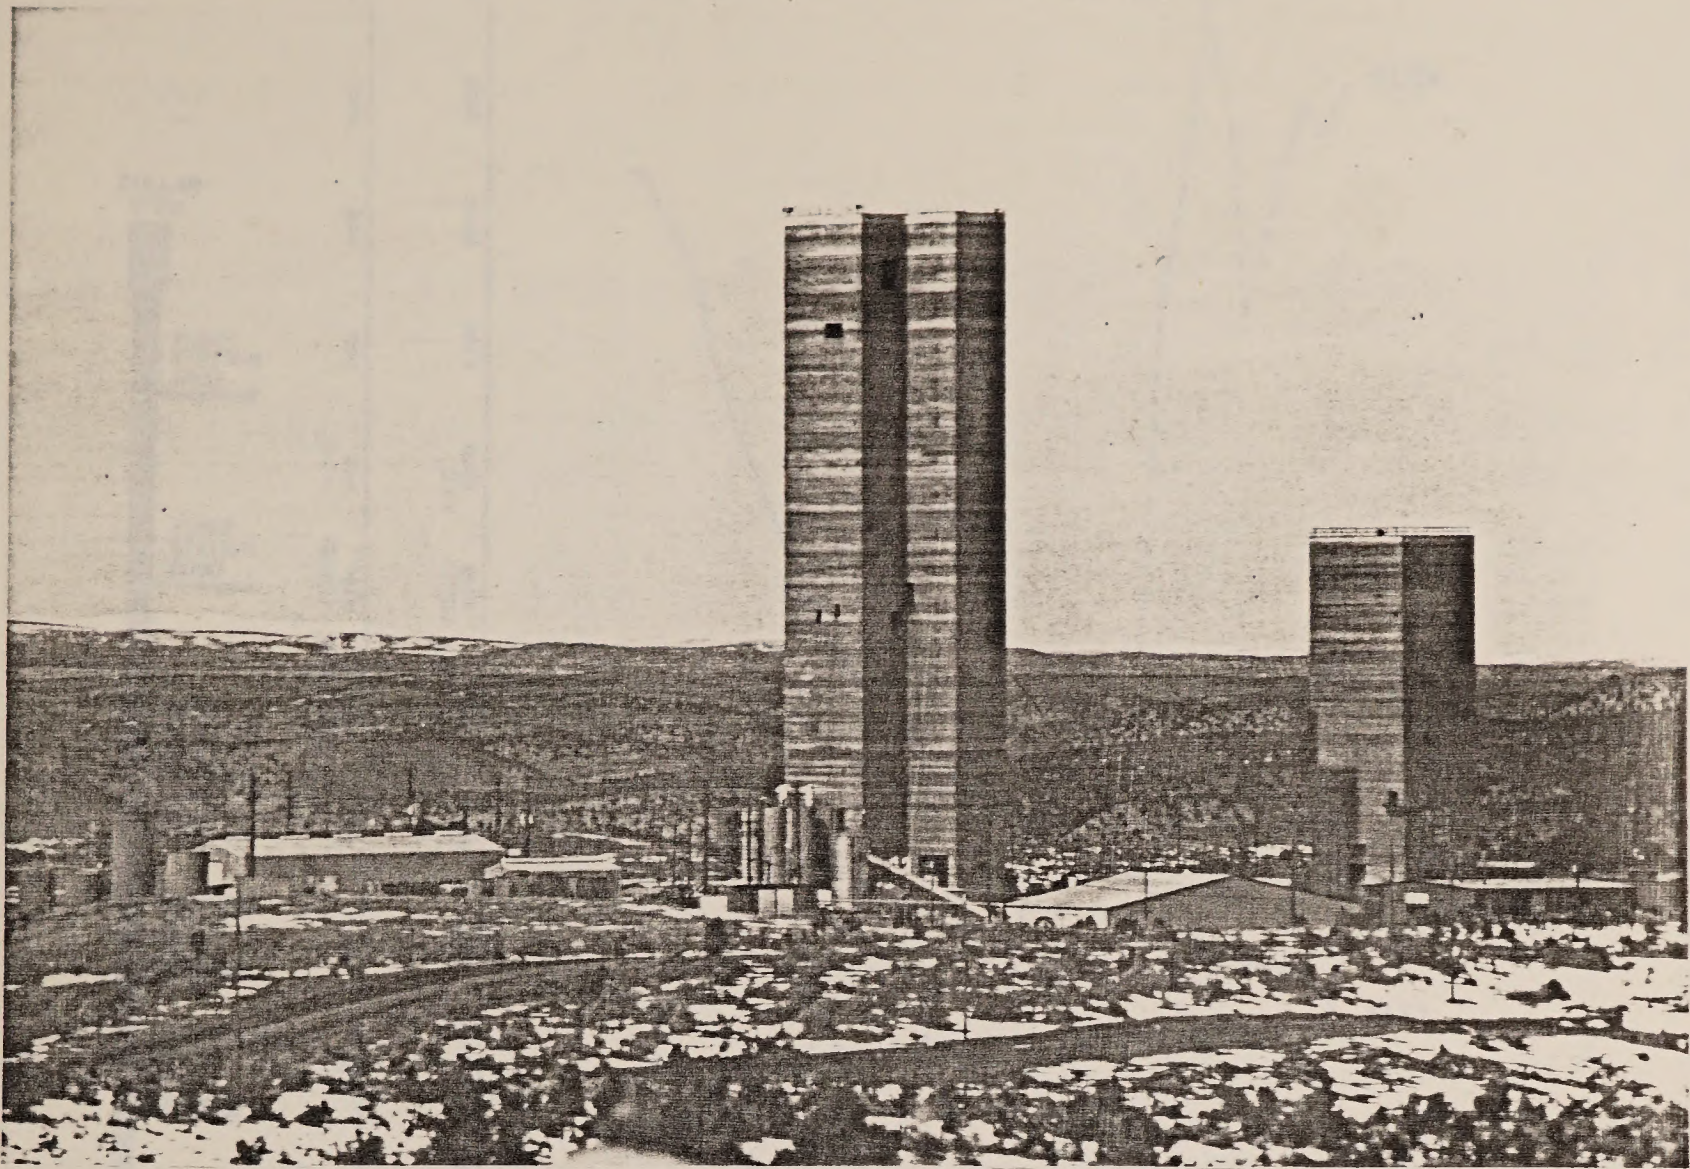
View toward northwest across Tract C-b Mine Support Area showing the two concrete slip formed hoist towers (headframes) over the commercial Service and Production shafts. The shorter tower (right) is 178 feet (54 m) tall and will house a 1,500-hp hoist for two 270-man capacity skips operating in the 34-foot (10.4 m) diameter 1,839-foot (561 m) deep Service shaft. This shaft will be used to move workers and equipment from the surface to the various mine levels. At full operation, better than 1,000 workers will ride these skips each day. The Service shaft will also be used for mine ventilation air intake through an adjacent ground level opening that interconnects 150 feet (46 m) underground.
